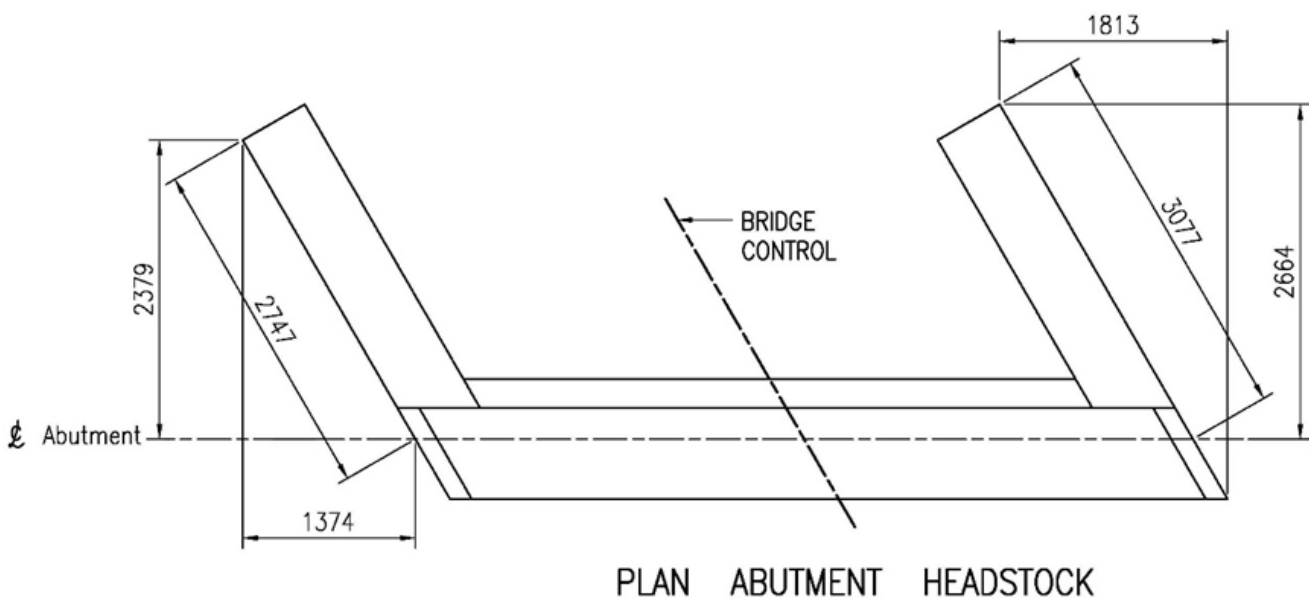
(b) - Diagram for calculating non-standard wing wall lengths - girder bridge
